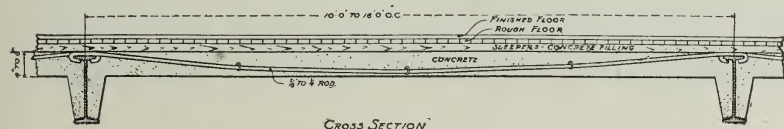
c. White Concrete Long Span Flat Floor Arch, System D.
